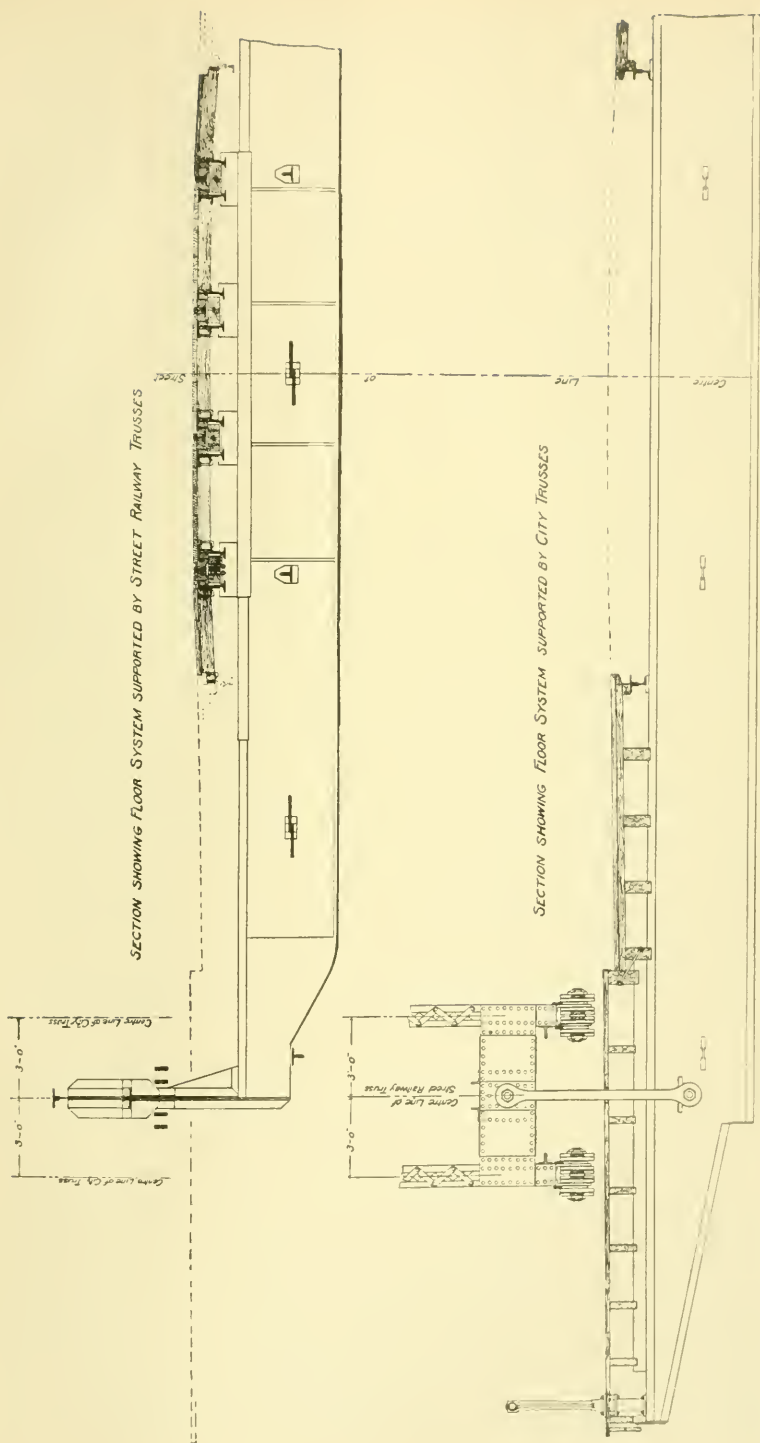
CROSS SECTIONS OF BRIDGE FLOOR, AS FINALLY REBUILT.
